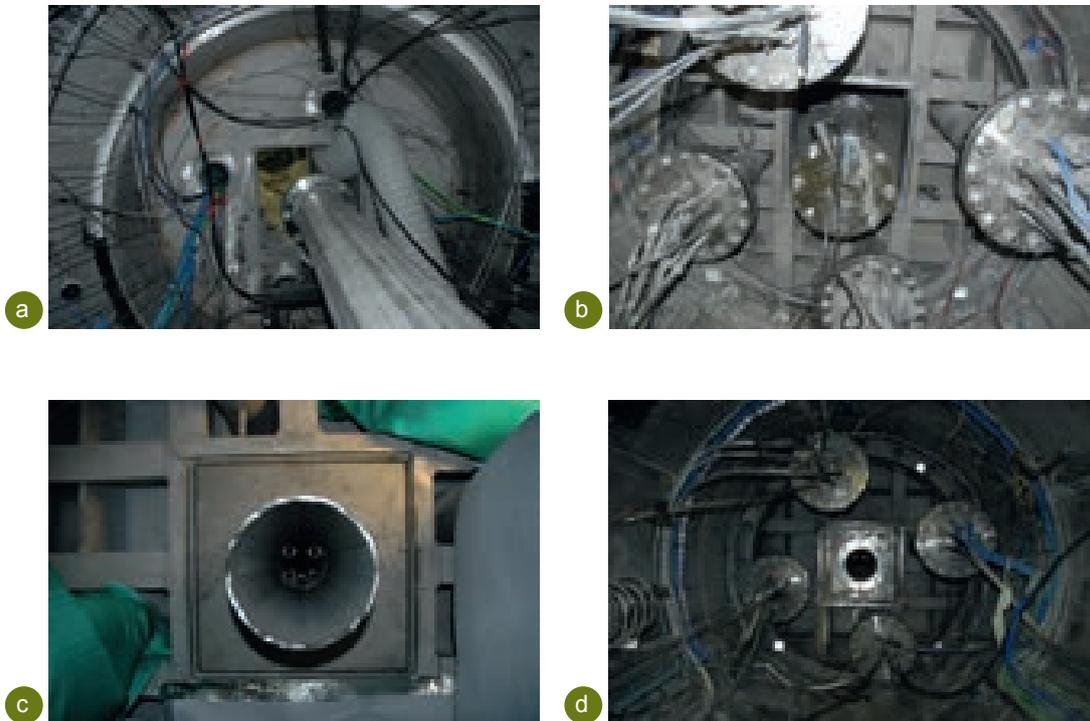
(a) Before backfilling, the central tube could only come to just before the hydraulic seal; (b) once backfilling was complete, the last tube section was assembled; (c) the flange on the last section of the central tube was cut to allow the assembly of the central plate onto the hydraulic seal; (d) after assembly of the central plate, this flange was again welded onto the end of the central tube.
